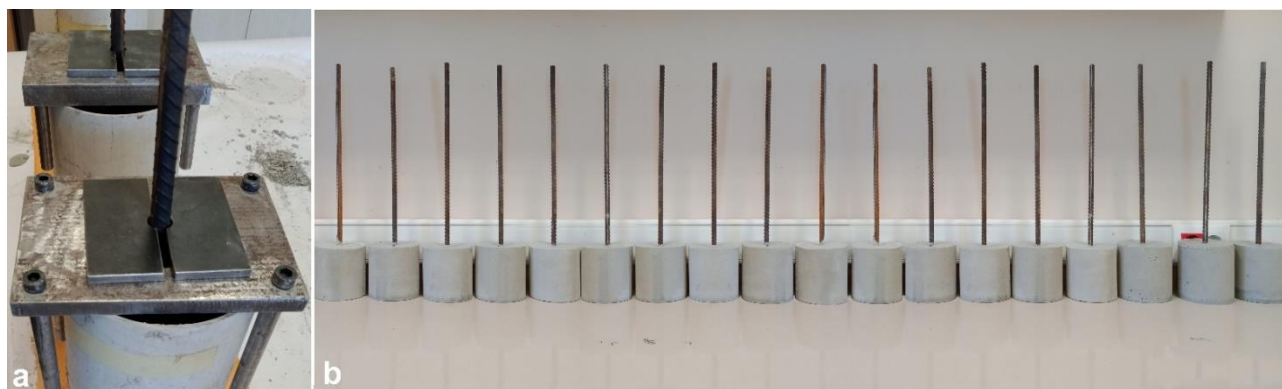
a) Plates for keeping bolt specimens stood vertical in grout mixes, b) grouted bolt specimens used in this study
